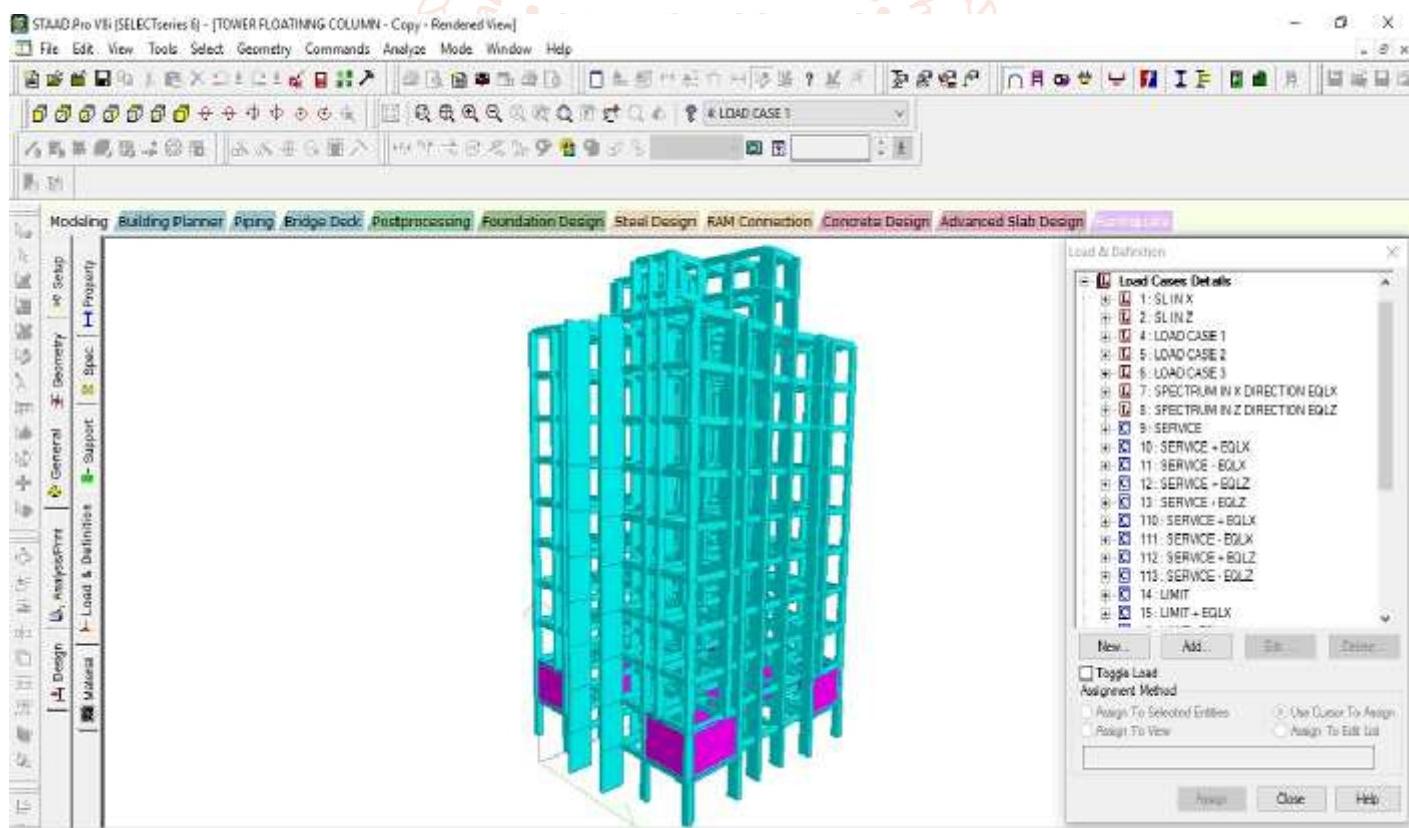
STAAD Generated 3D Rendered model of building having shear wall and floating columns.
